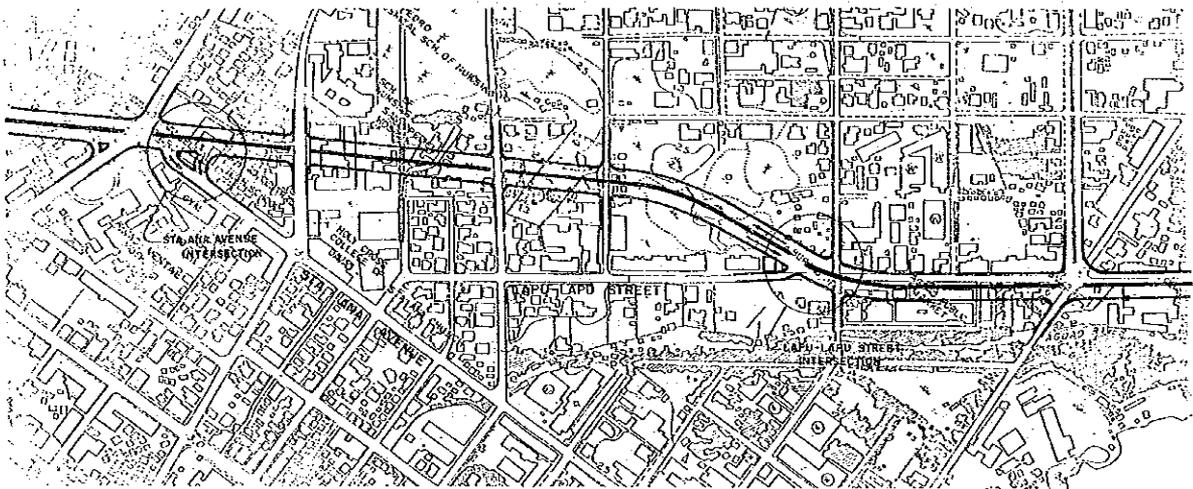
Alternative Route (6-lane Road: Sta. Ana Ave.—Lapu-Lapu St. Section)
